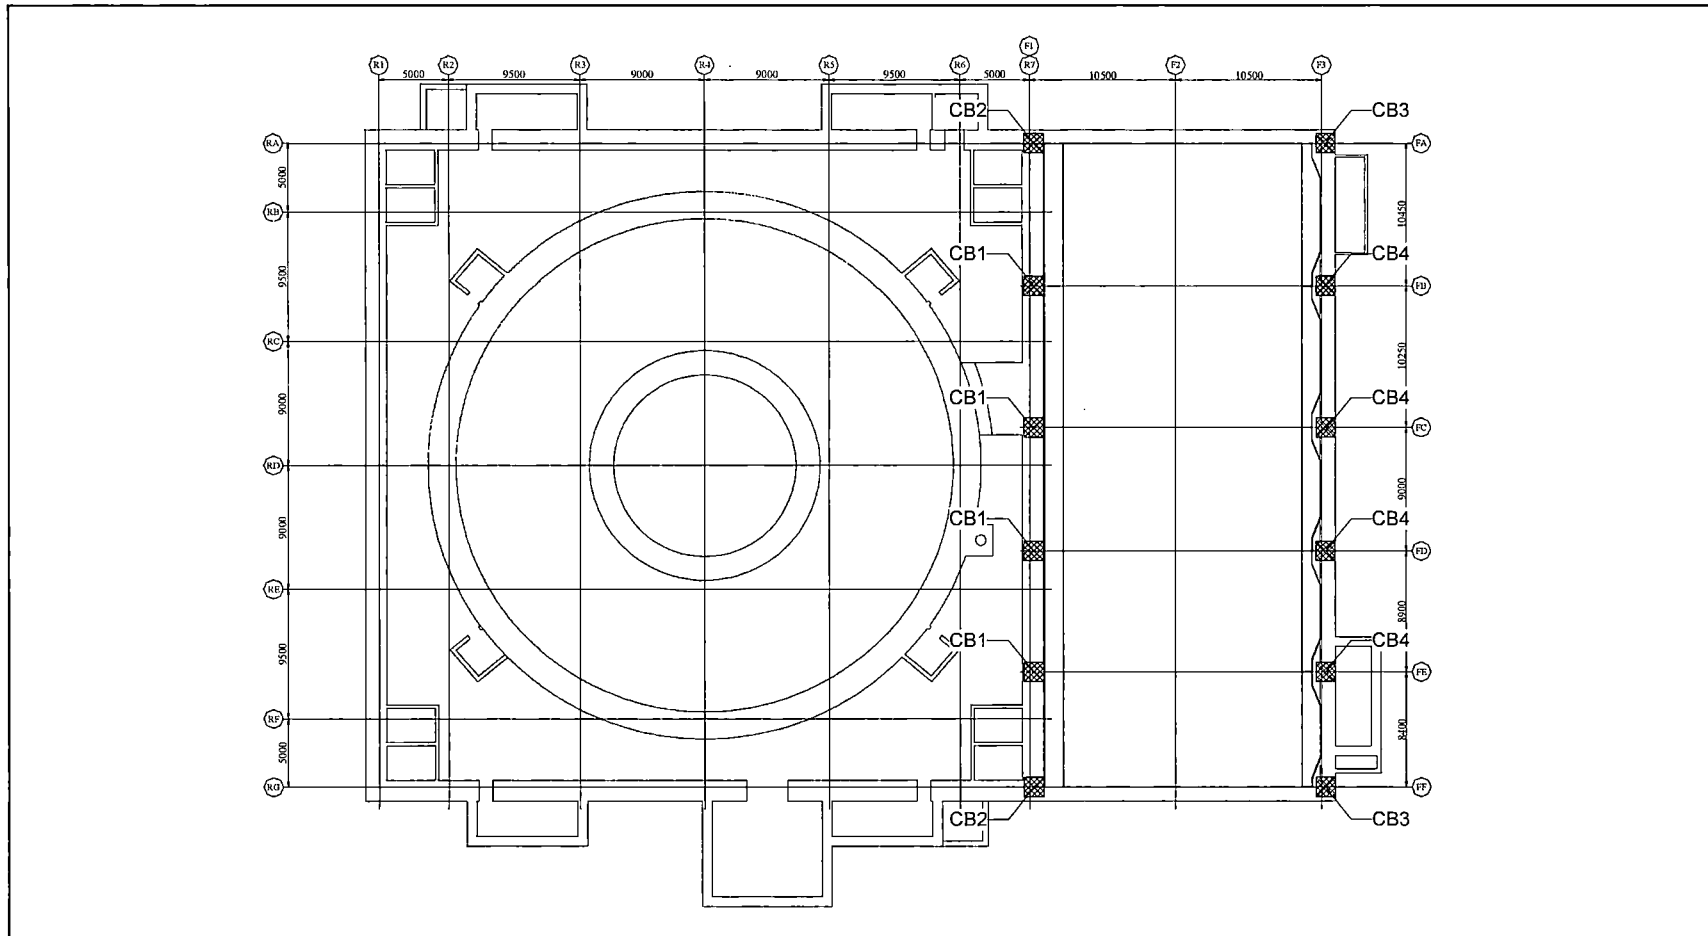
Application of Thermal Load on the Reinforced Concrete Girder and Column (EL 13,570)
